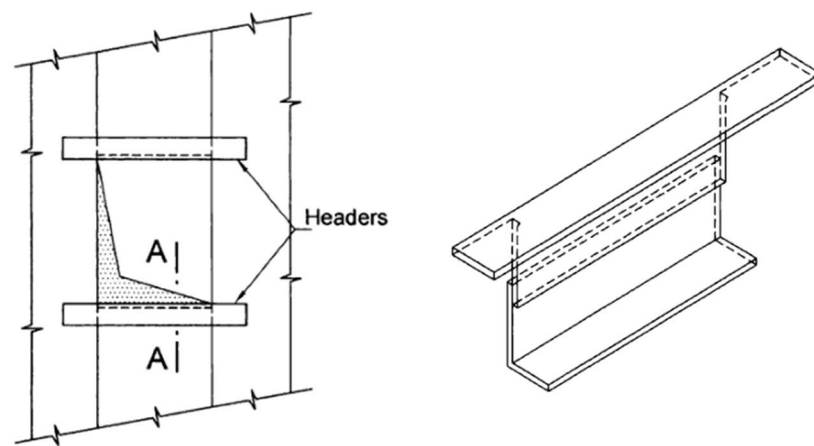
Example of an opening in a hollow core slab (left); header (right); (Calavera, 2012, p. 322)
